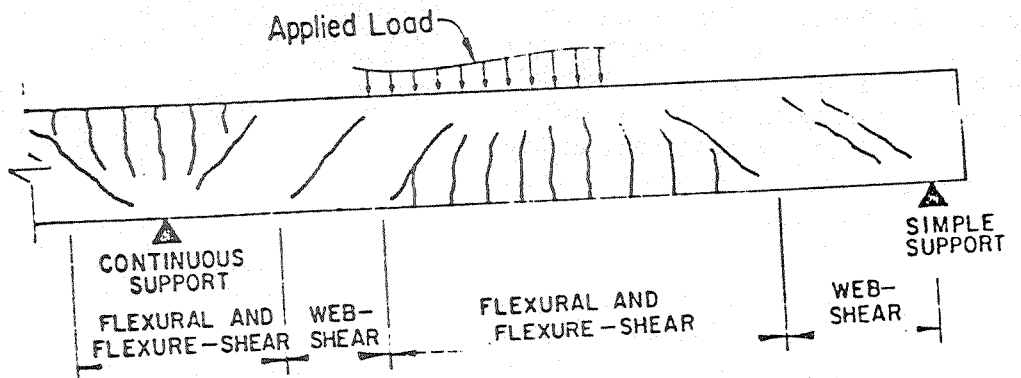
Types of cracking in concrete beams
